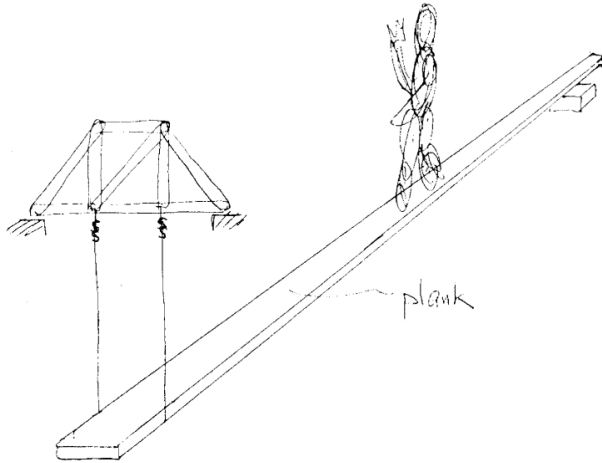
LOADING GEOMETRY OF TRUSS PROJECT
